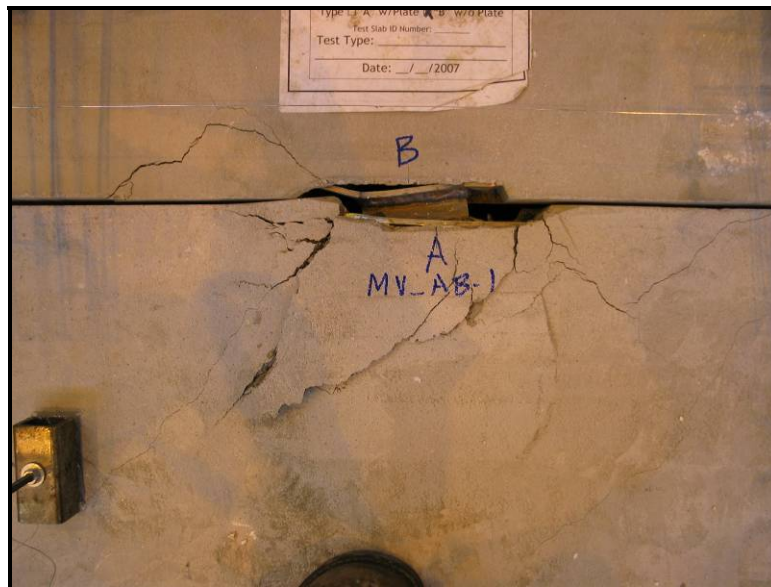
Specimen MV\_AB-1 - condition of A-B connector at a shear load of 12.0 kips showing spalling of concrete
